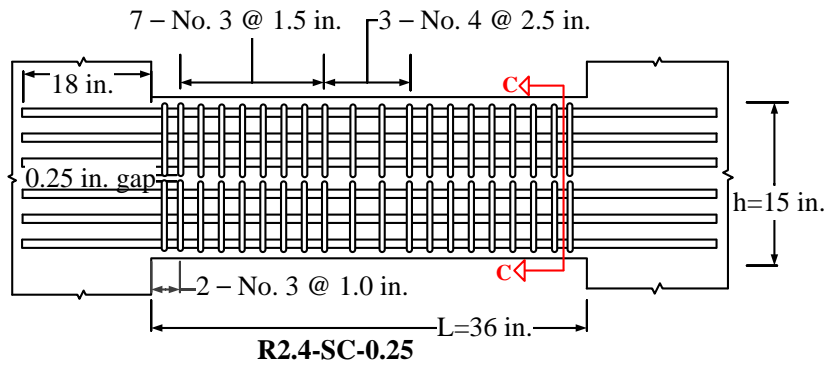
Reinforcement details of R2.4-SC-0.25
